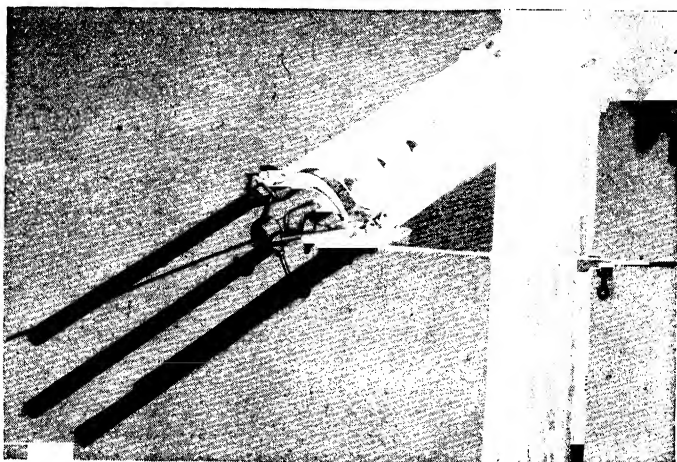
Heavy-duty strain carrier mounted on dead-end pole. Note two-pole cradle provided to support insulator string after being uncoupled from line-conductor clamp. (Courtesy James R. Kearney Co.)
